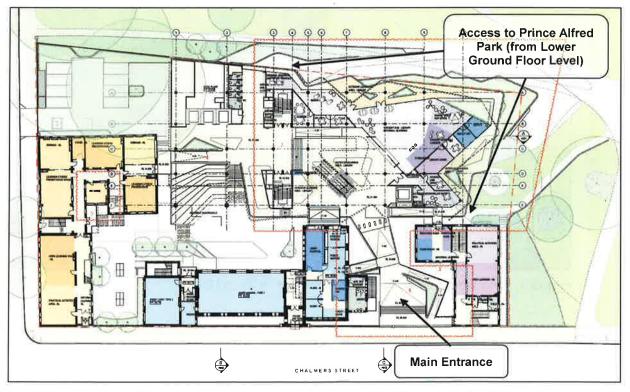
Proposed Ground Floor plan (main entrance level) (Source: RTS 2017)
